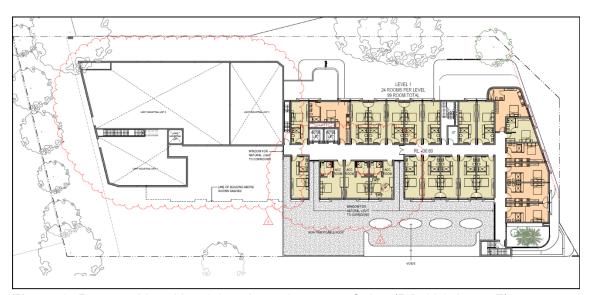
Proposed hotel level 1 and warehouse roof plan (DA-101, Issue F)
